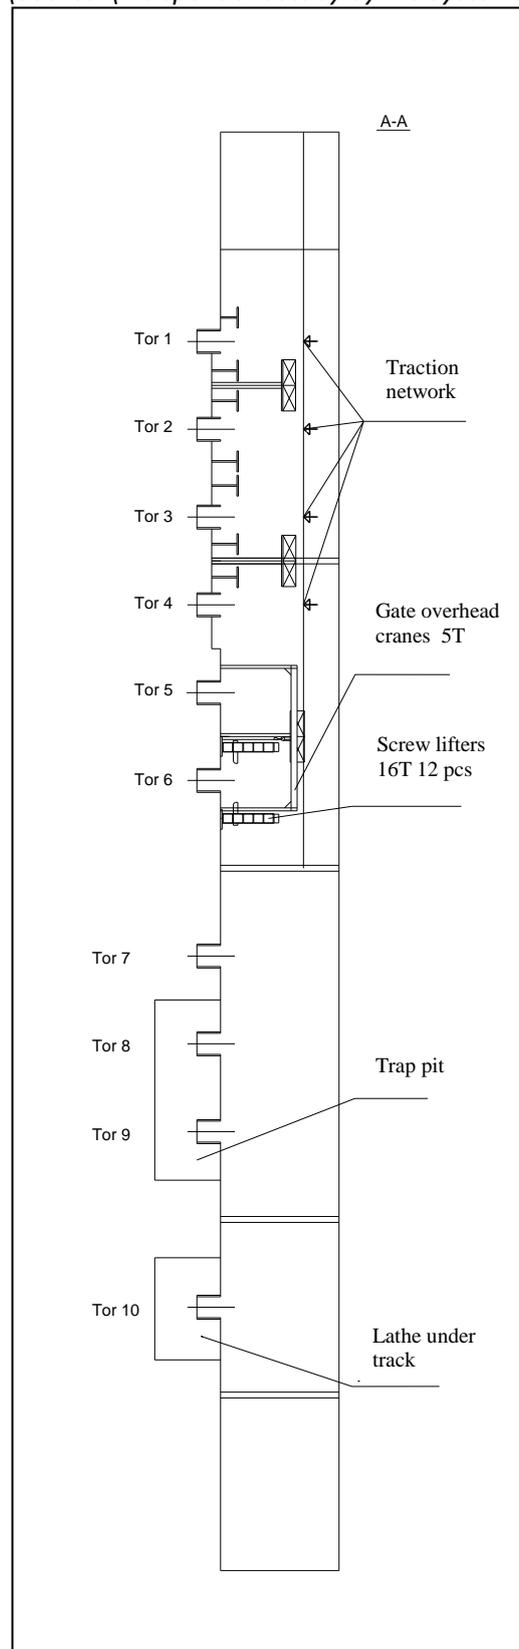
Rolling Stock Repair and Operation Section in Sochaczew - Cross section of the existing inspection and repair room with proposed stations.
